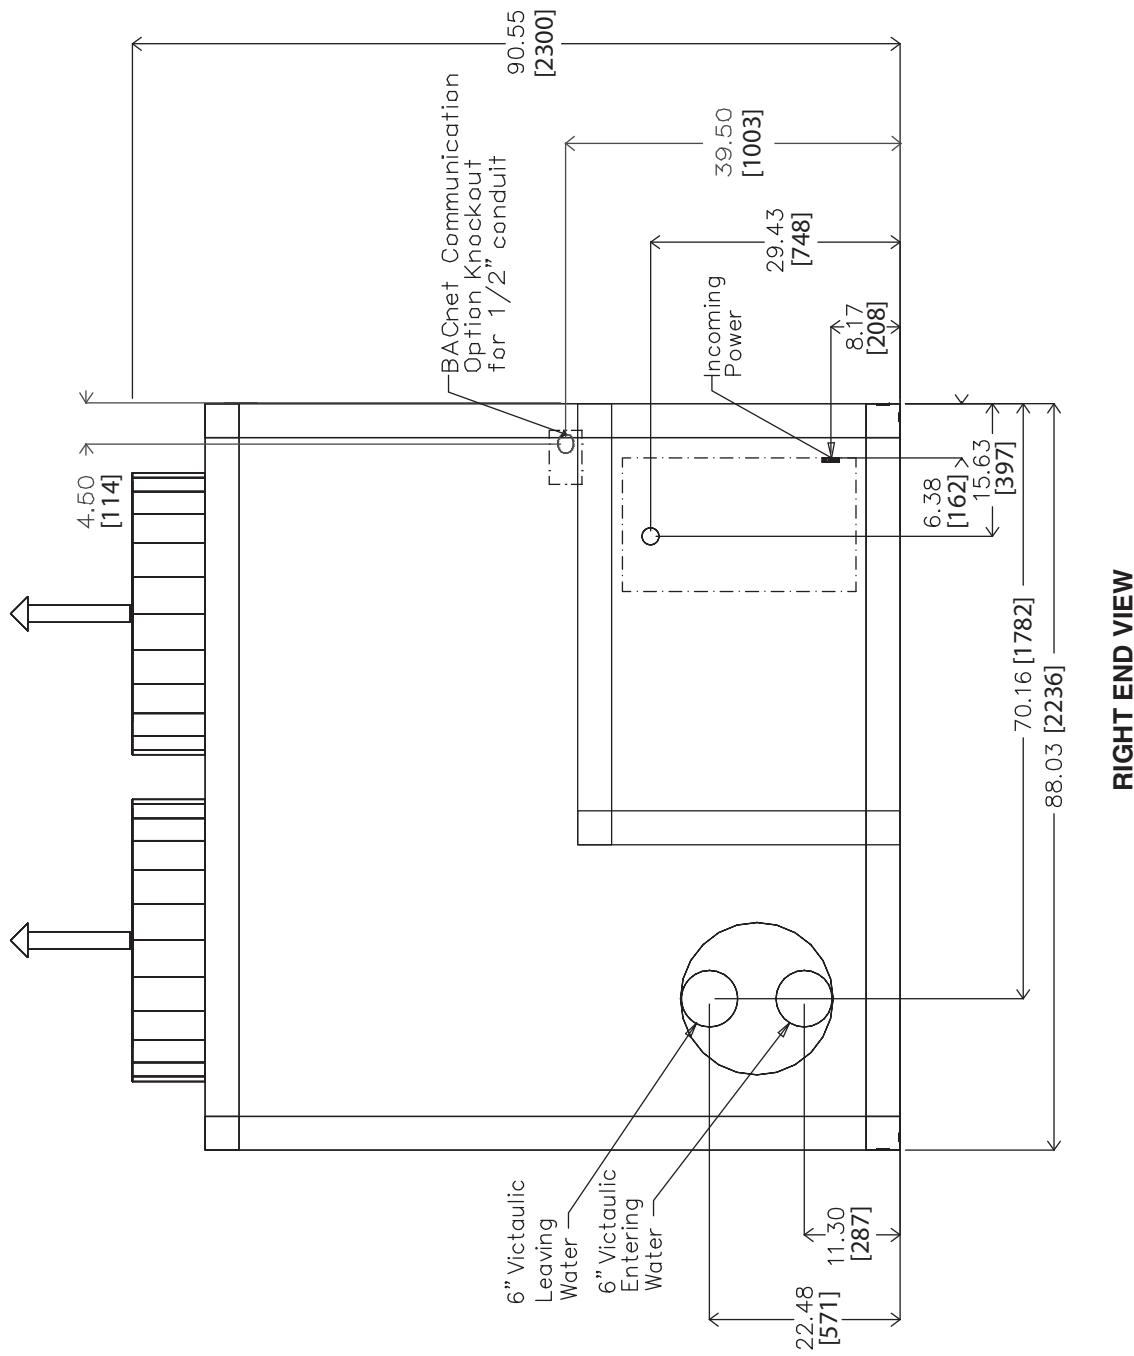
30XA220/240 Air-Cooled Liquid Chiller Dimensions (cont)
